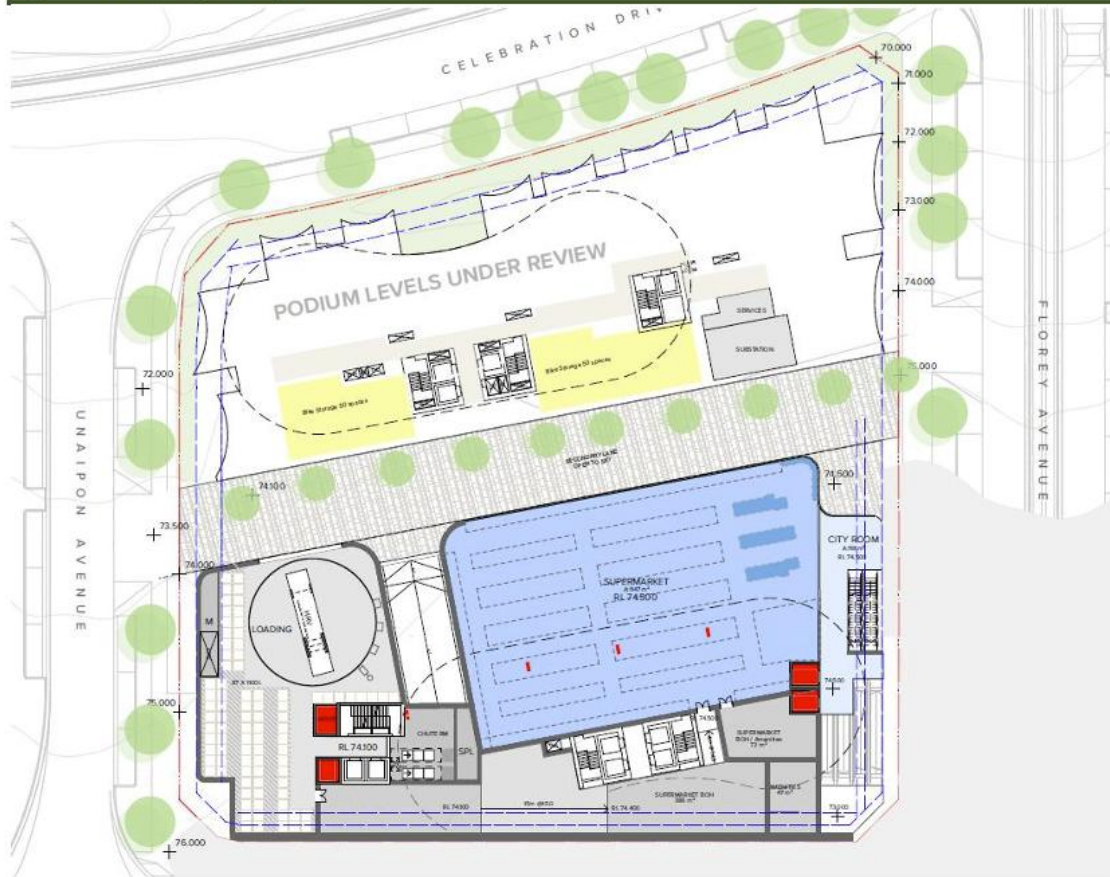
Subject site (Ground level) refer to detailed plans for the layout for all floors.
